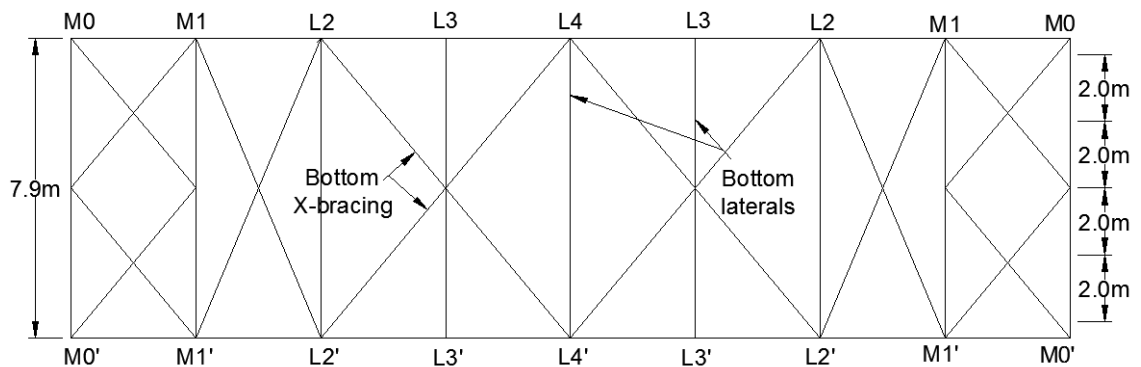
shows the 30.0m span K-type semi-deck truss bridge. Centre to centre distance between two trusses is 7.9m and height of truss is 8.5m. Cross girders are spaced at 3.75m and two stringers are spaced at 2.5m c/c. Arrangement of cross girders and stringer beams is same as in case of the deck type truss bridge.
